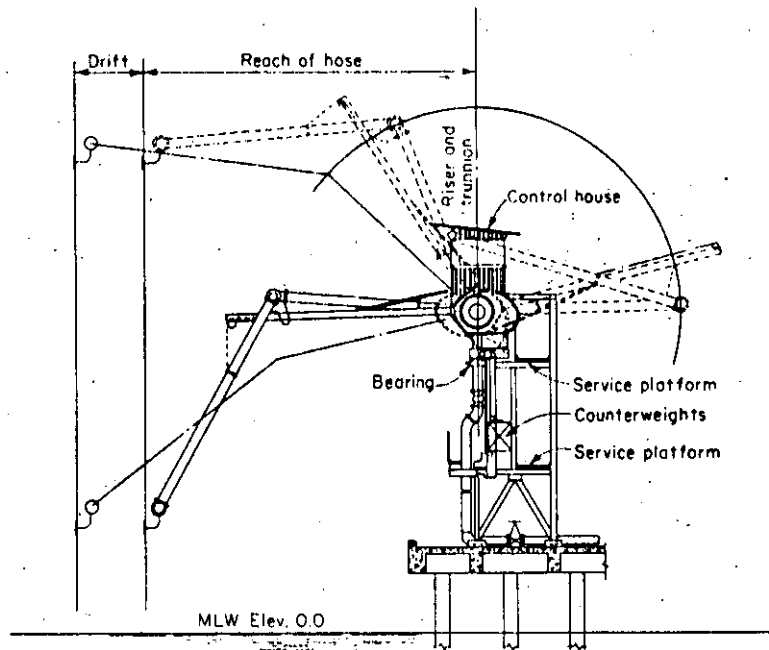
Installation using "Chiksan" hydraulically controlled marine loading arm. (Courtesy of the Chiksan Co.)
